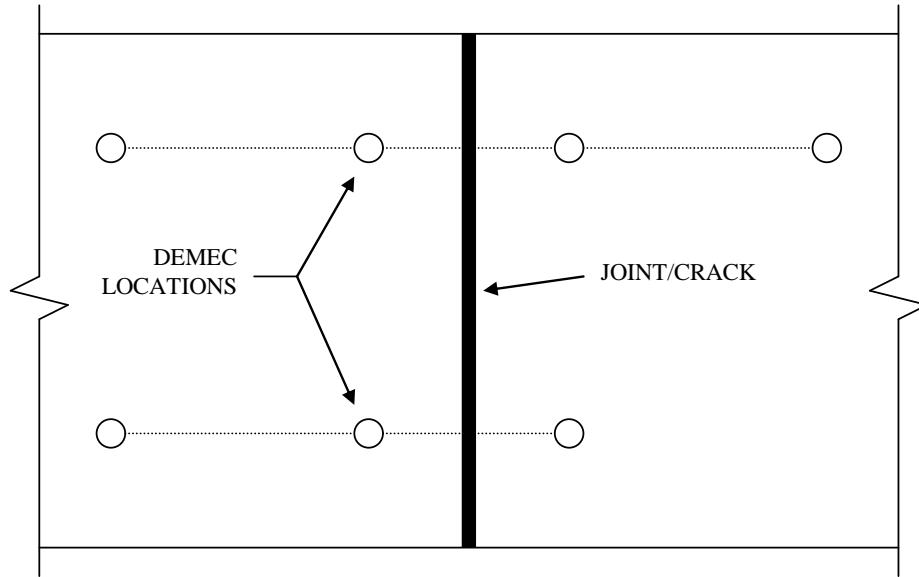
DEMEC Stud Wall Layout (Top Row – Construction Joint Configuration; Bottom Row – Crack Configuration)
